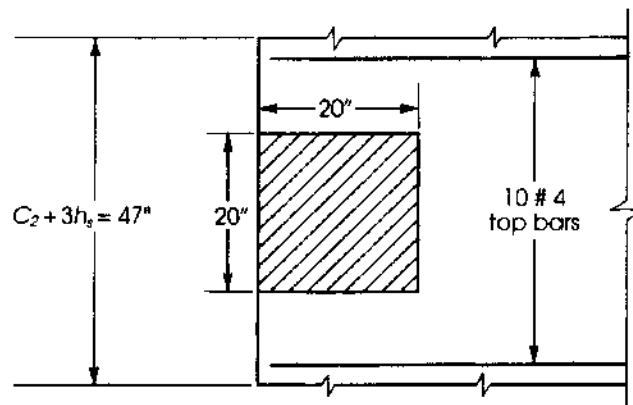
Example 17.9: concentration of reinforcement within exterior column strip.
